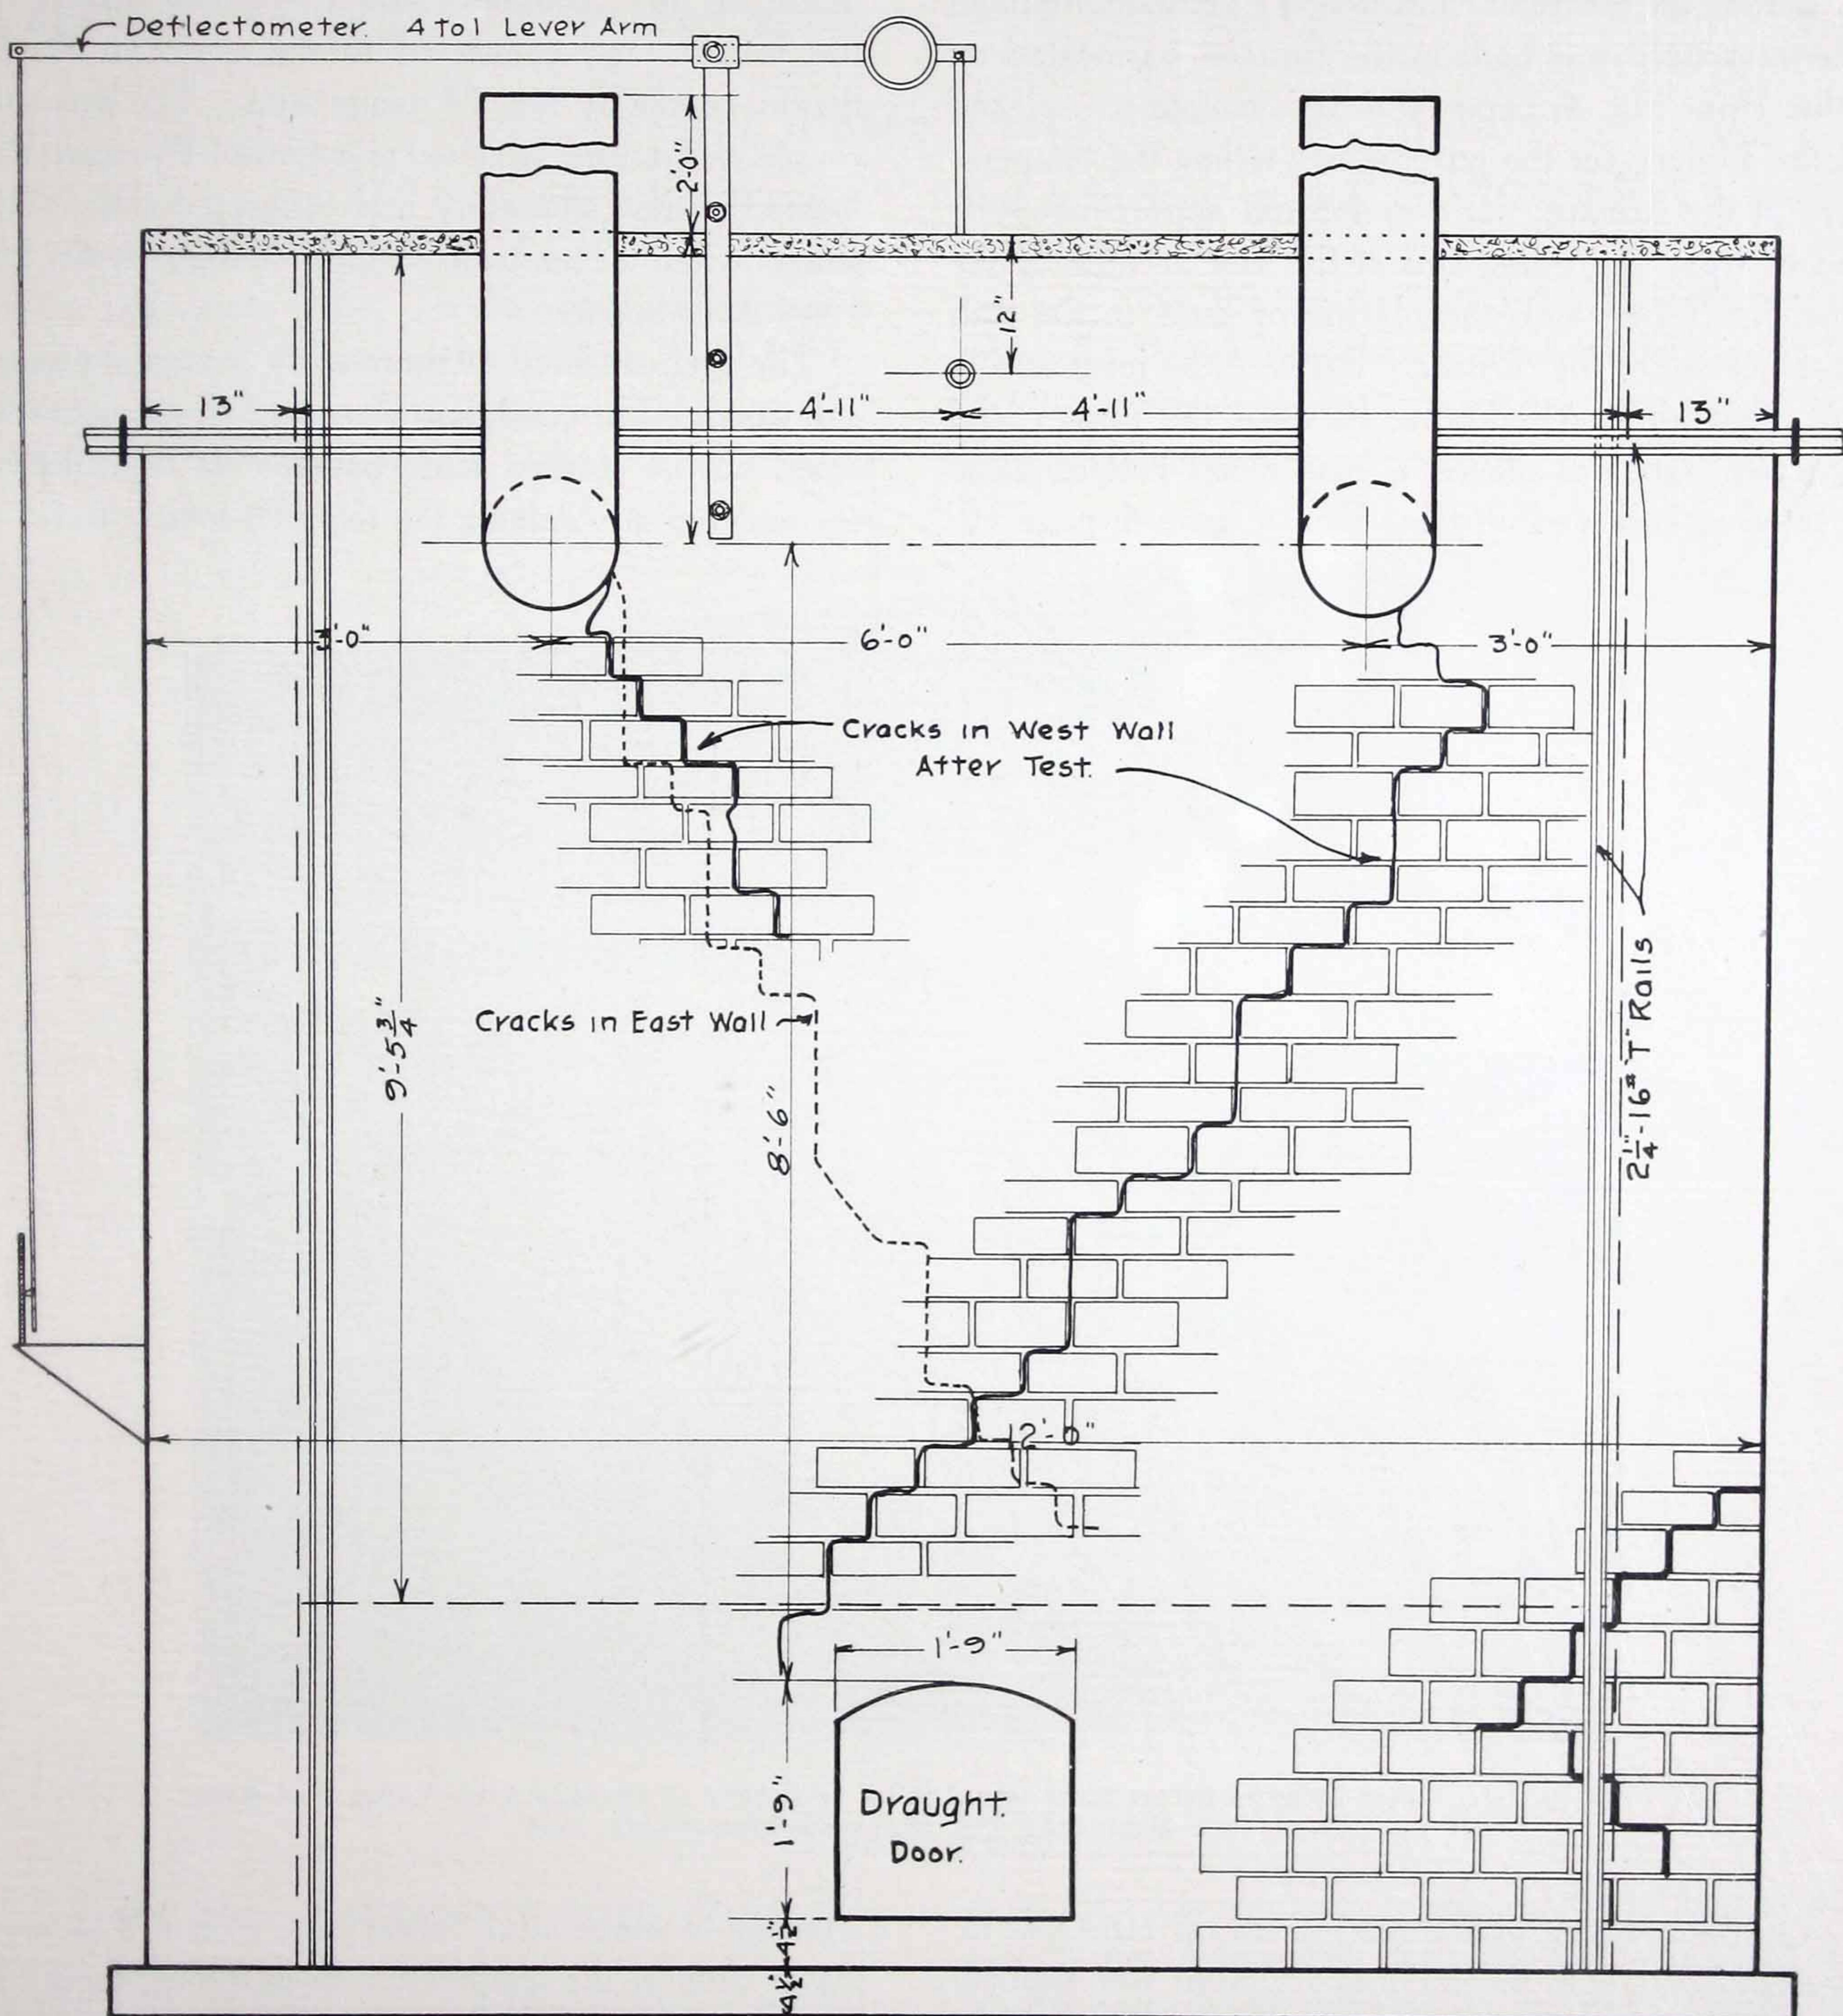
Side Elevation of Furnace Showing Location of Cracks in Walls as Result of Test.
